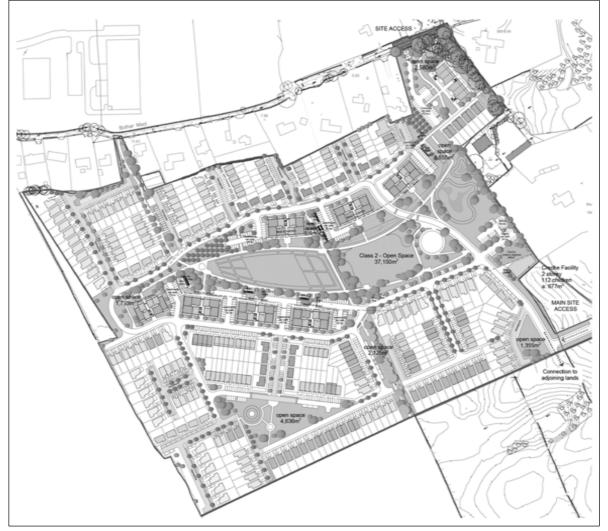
Alternative Parking Arrangement to Zoned Open Space
